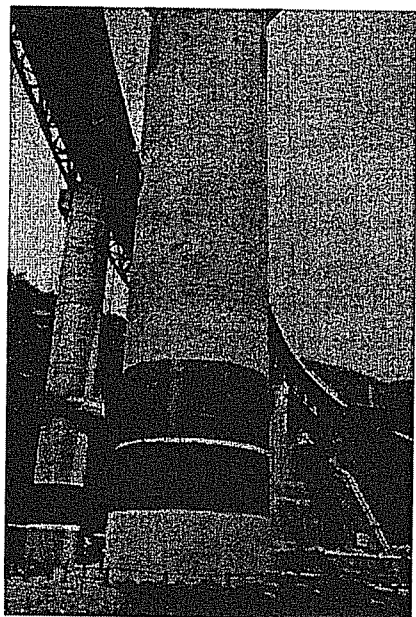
Common Damage Progress of Reinforce Concrete Column
